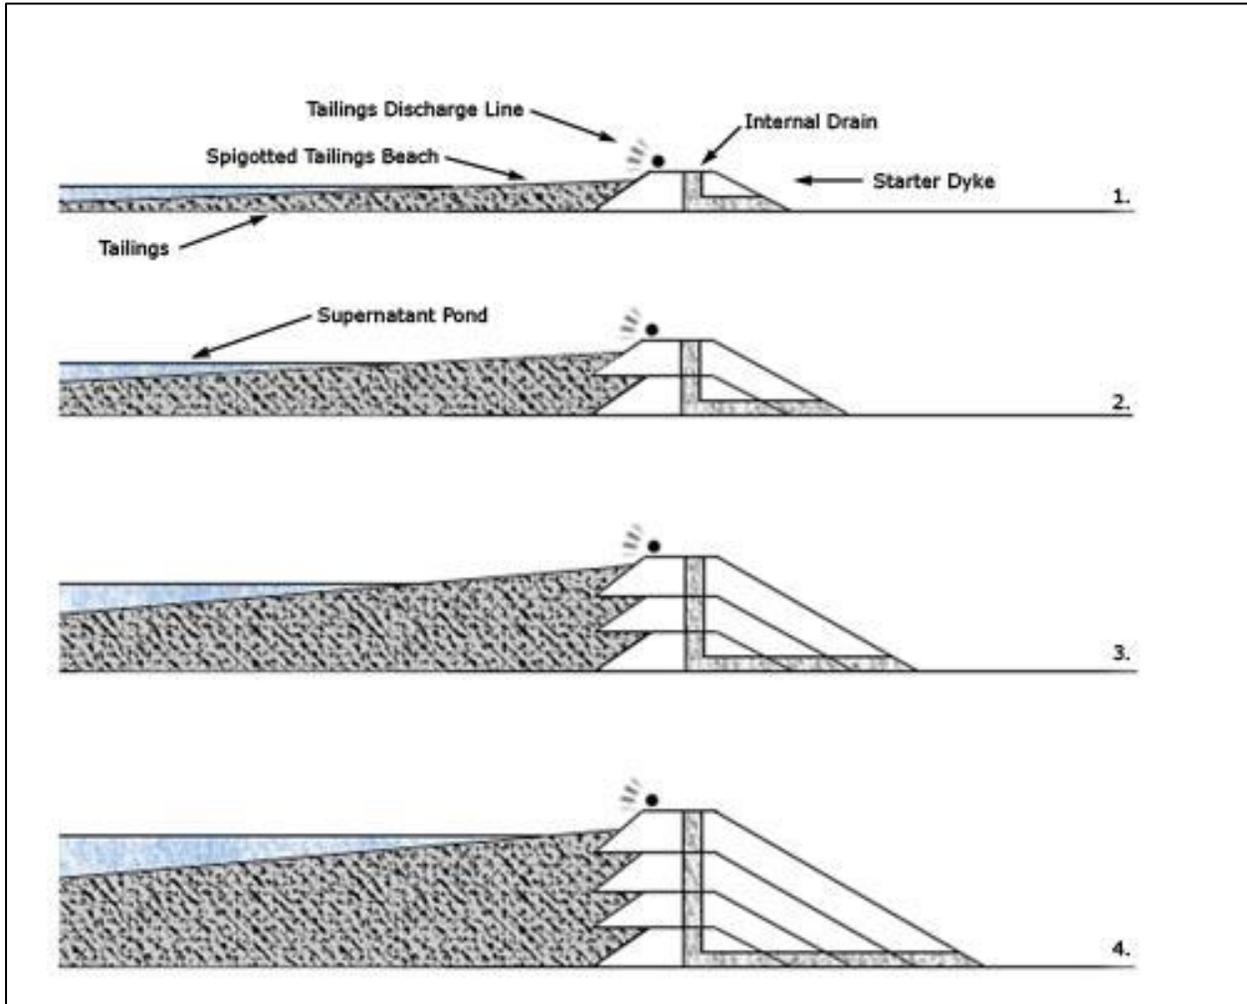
In the centerline construction method, successive dikes are constructed by placing construction material on the beach and on the slope downstream of the previous dike. The central lines of the raises coincide as the dam is built upwards. Dikes can be constructed from mine waste rock, natural soil, natural rockfill, or the coarser fraction of tailings (with proper compaction). The centerline method is intermediate between the upstream and downstream methods (see Figs. 2a-b) in terms of cost and risk of failure. The resistance to seismic and static liquefaction is moderate because there are still some uncompacted tailings below the dikes. It is still necessary to maintain a suitable beach to maintain a sufficiently low water table within the dam. Figure from TailPro Consulting (2022).
